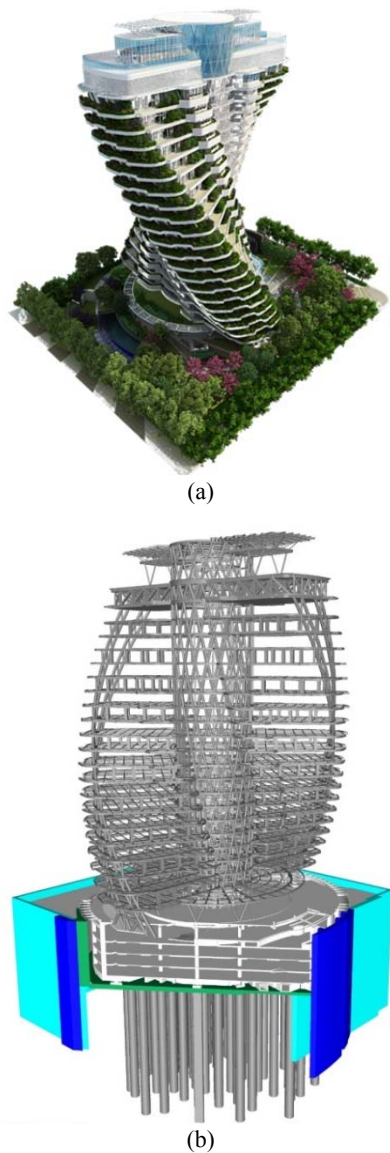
(a) Appearance of new building; (b) Structure model of new building
